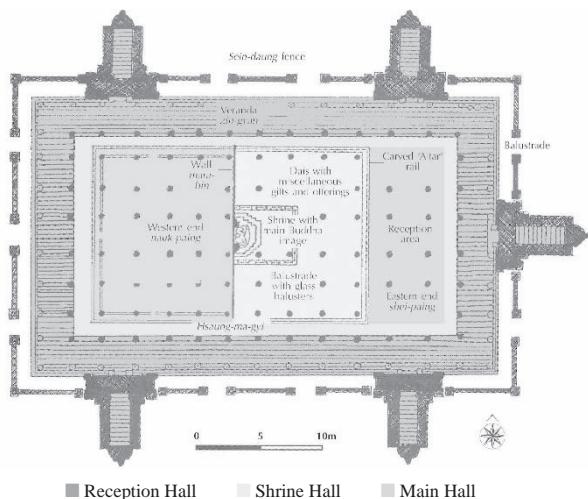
Layout Plan of Shwe-Nan-Daw Monastery^{*8}
